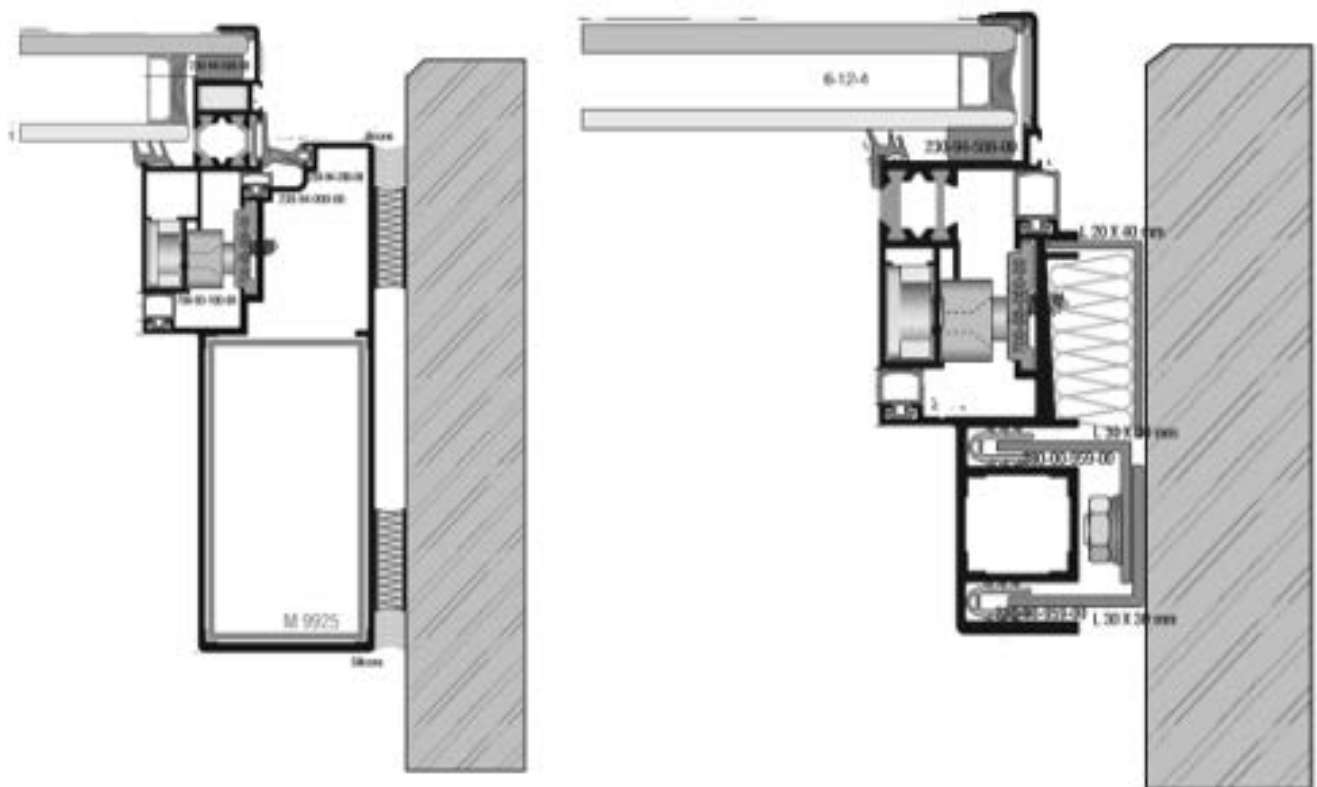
Insulating curtain walling with masonry (Alumil)
